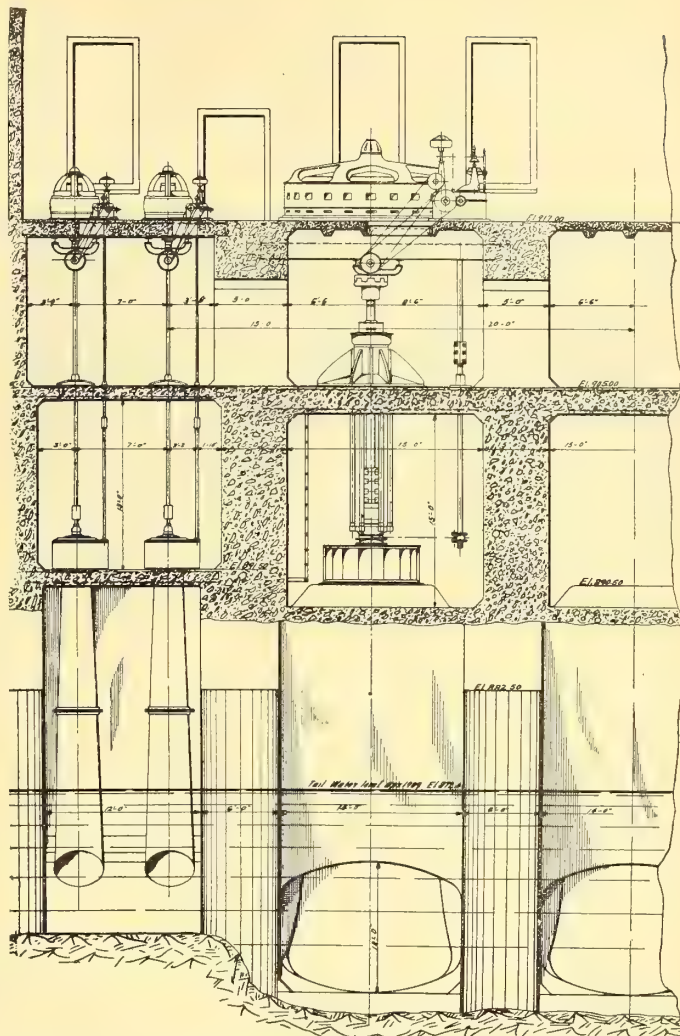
Vertical Longitudinal Section of Power House of Cobalt Power Company.
